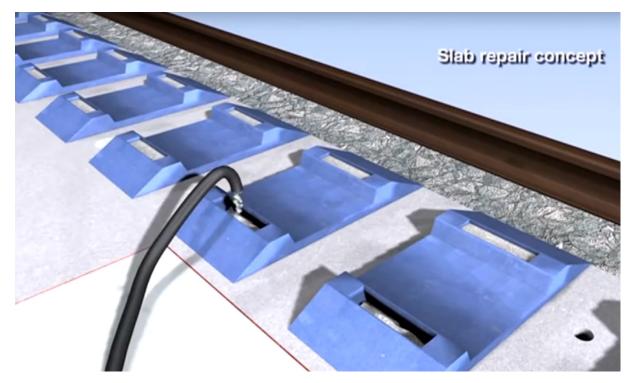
Repair of support shoulder with special formwork (PORR Bau GmbH, 2013)
